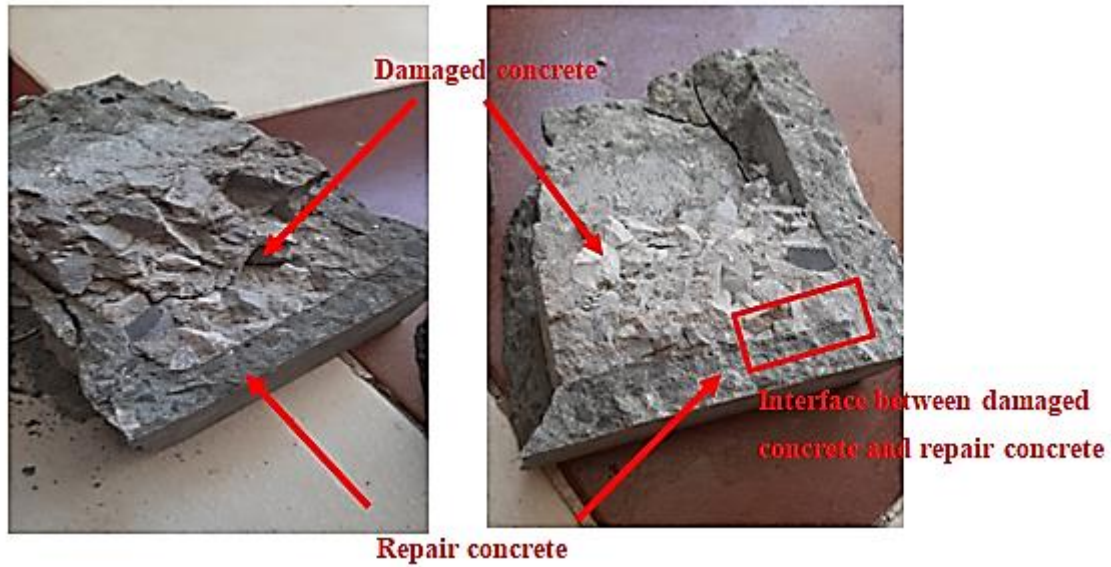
The adhesion between heated concrete specimens and the repair concrete.
